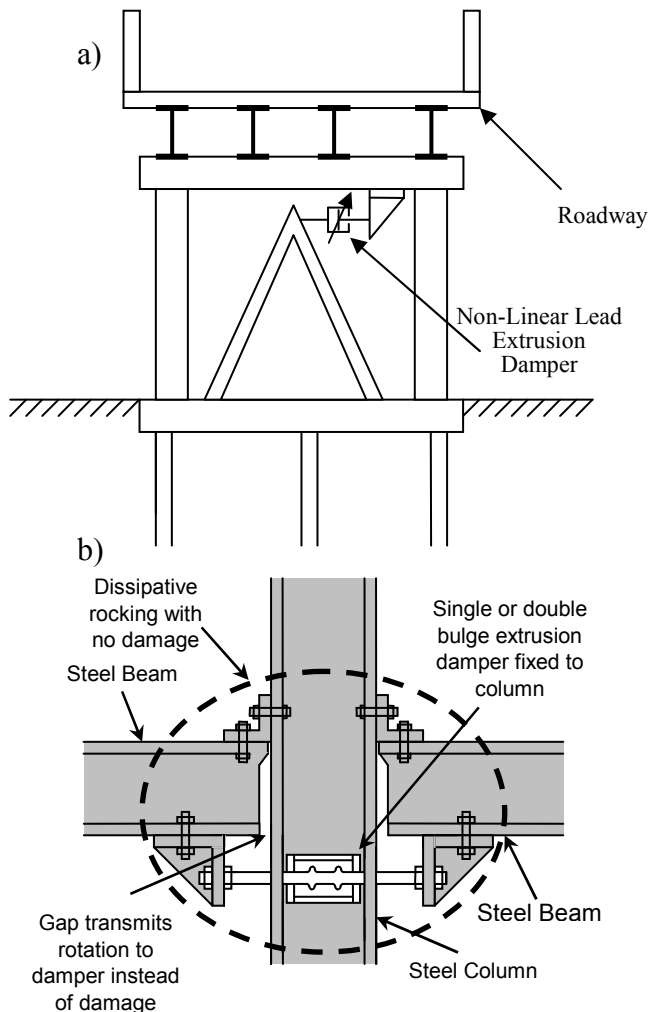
Possible placement of dampers into structural connections – a) a bridge pier, and b) a steel joint
